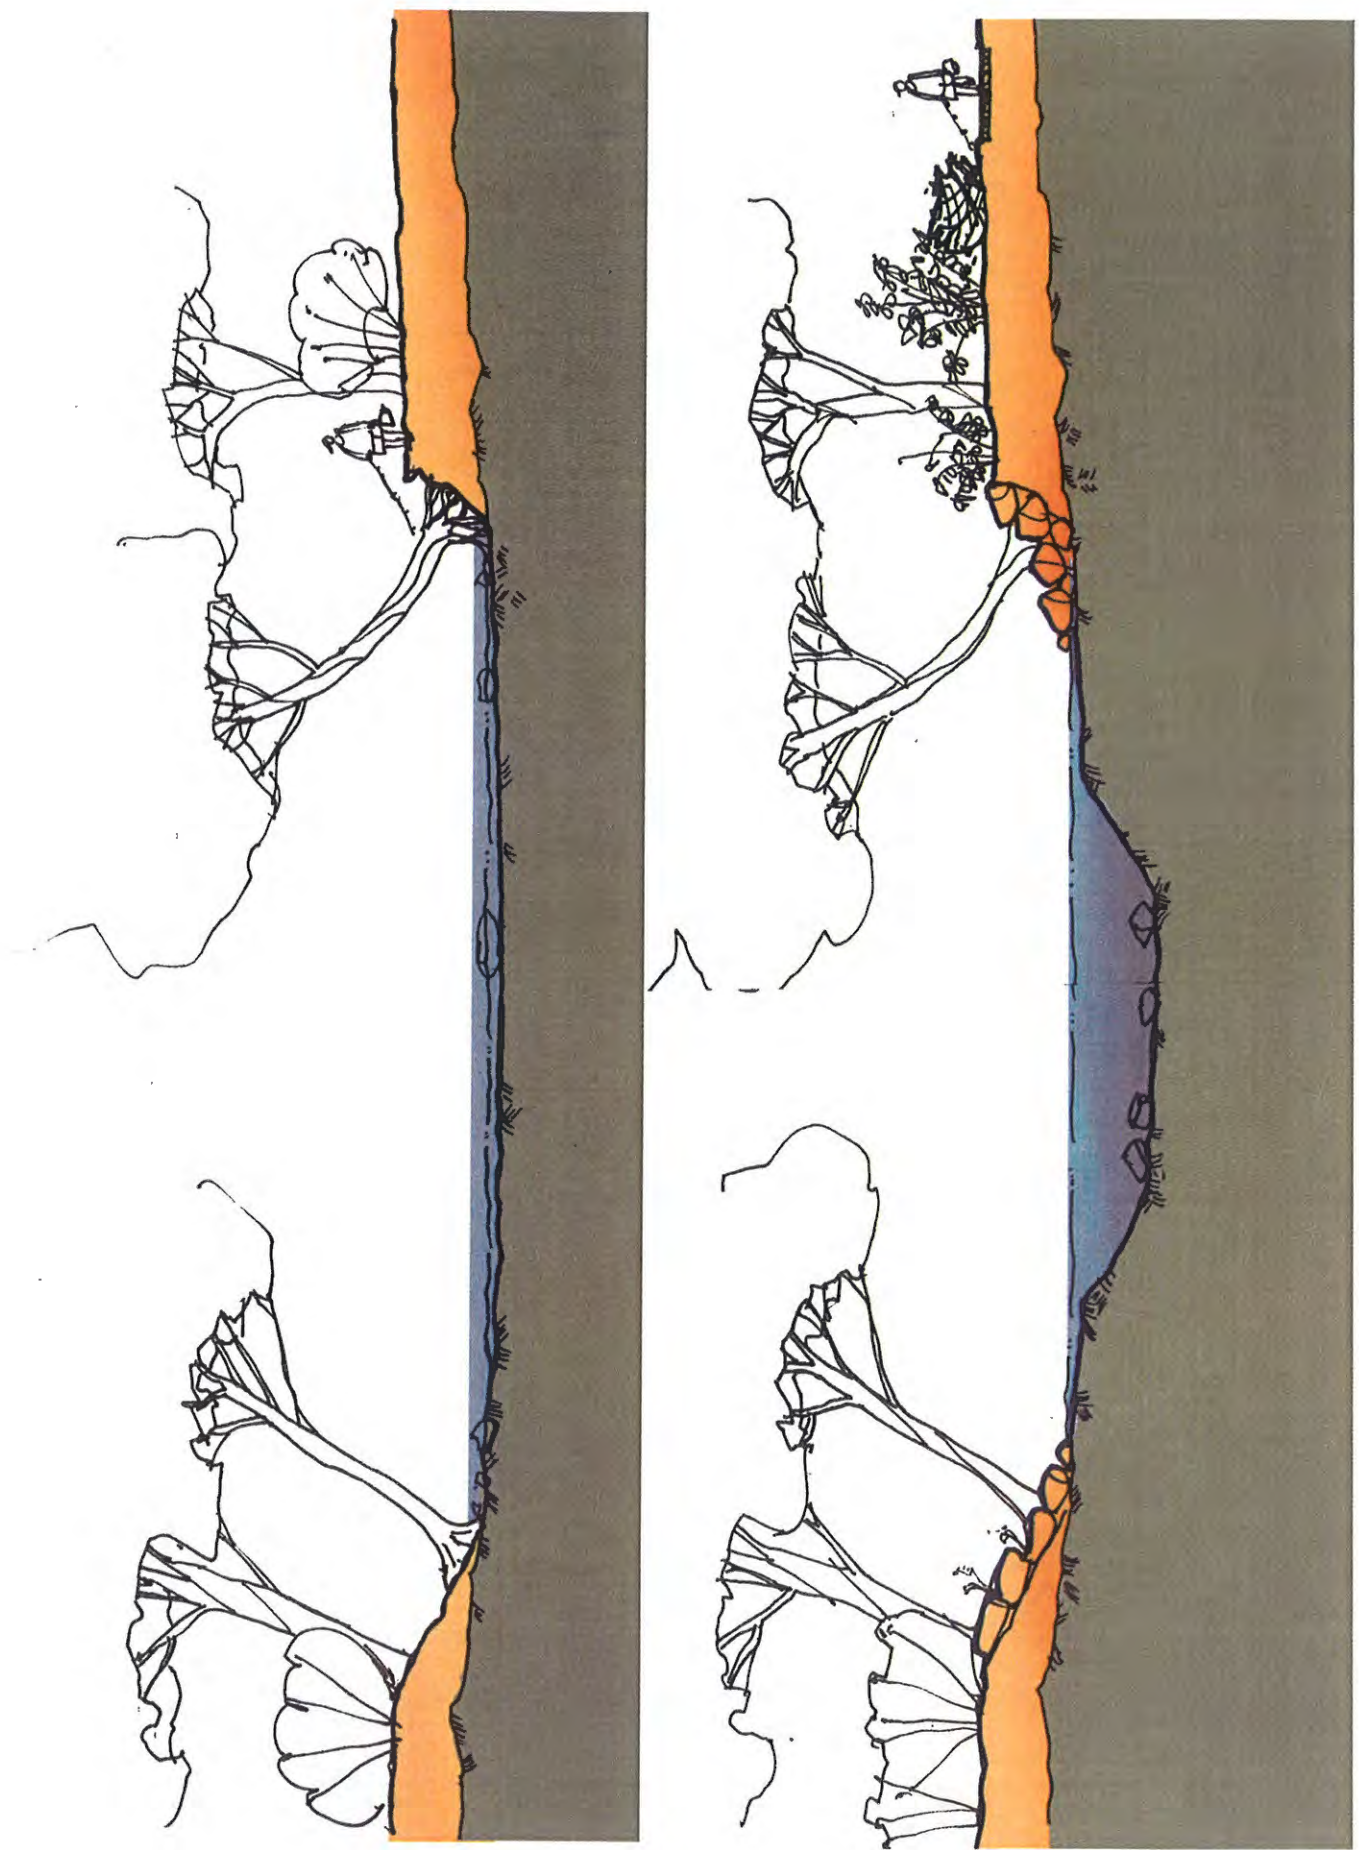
EXISTING AND PROPOSED CHANNEL CROSS SECTIONS
